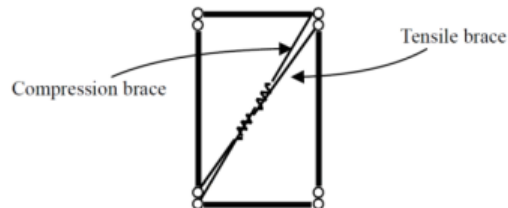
Outline of bracing shear wall (Nakagawa 2011)
